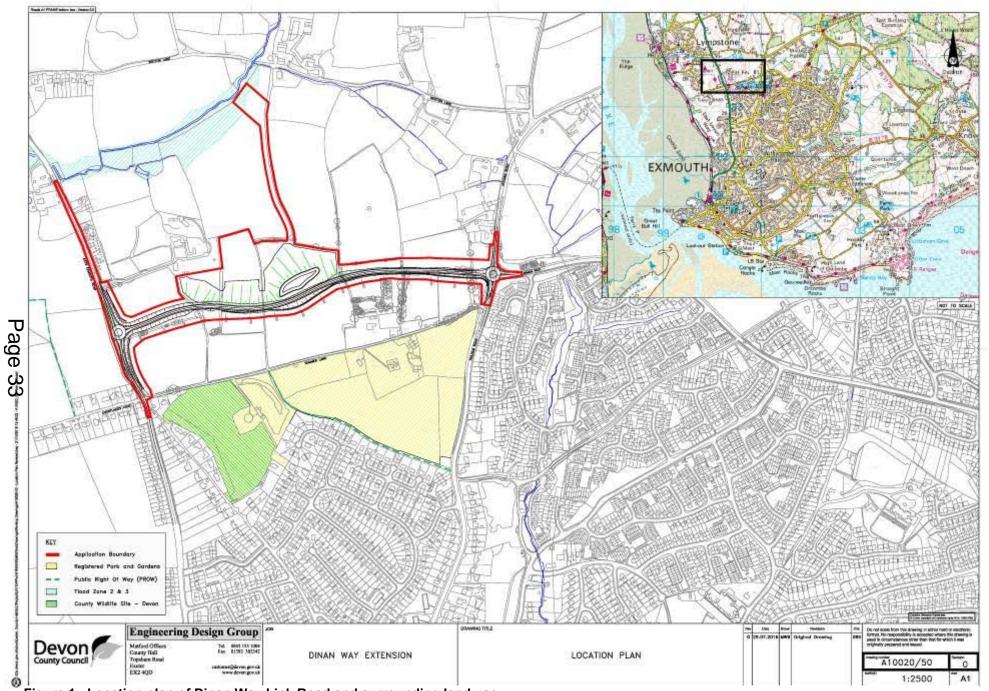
Location plan of Dinan Way Link Road and surrounding land use
